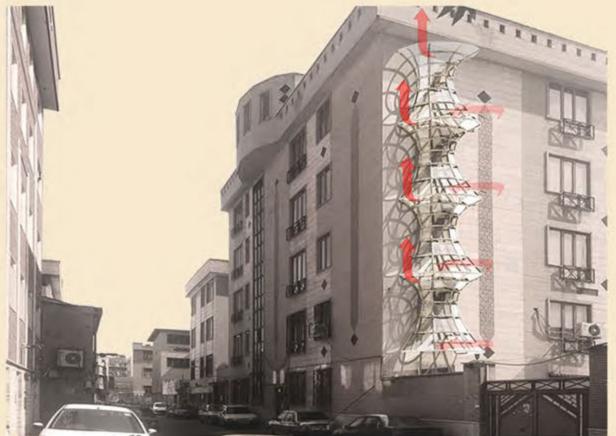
Section and elevation of fully conceptual tensile structure windcatcher
